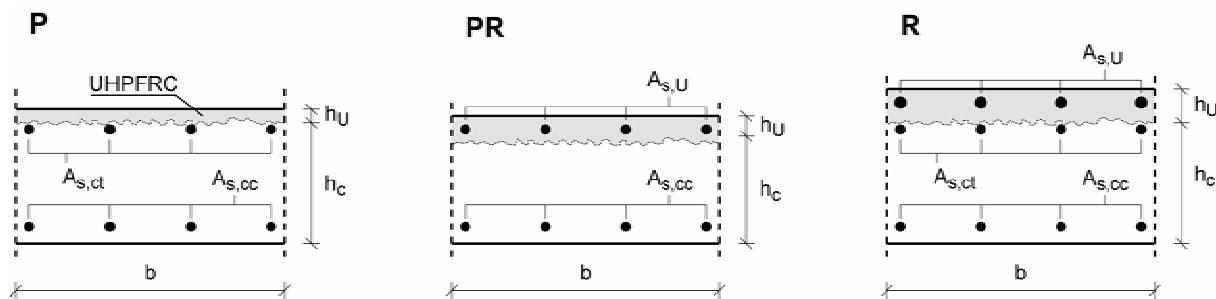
Geometries of “UHPFRC-concrete” elements for bridge deck slabs, after Habel (2004).
